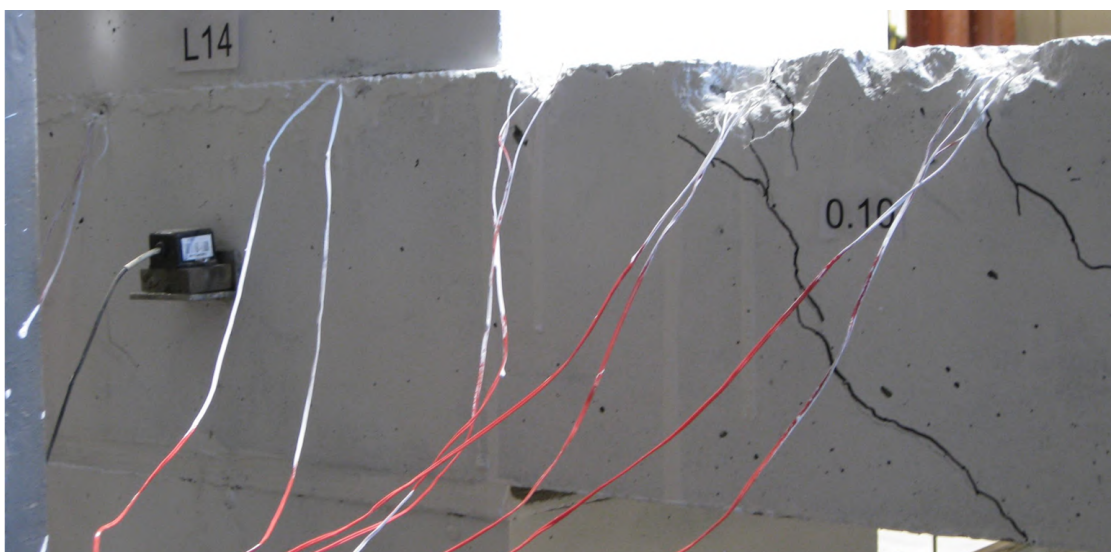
Specimen 3 free edge face cracks at $V = 154.9$ kN (west side)
